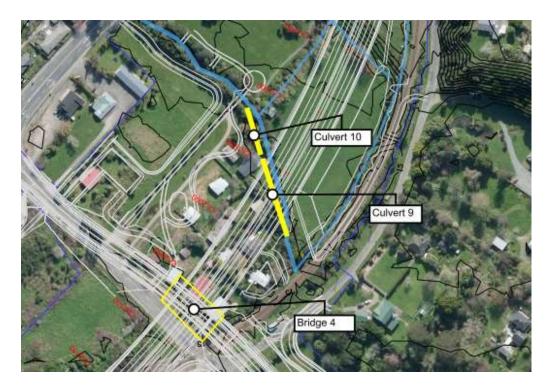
Location of Culvert's 9 and 10 north of Bridge 4
